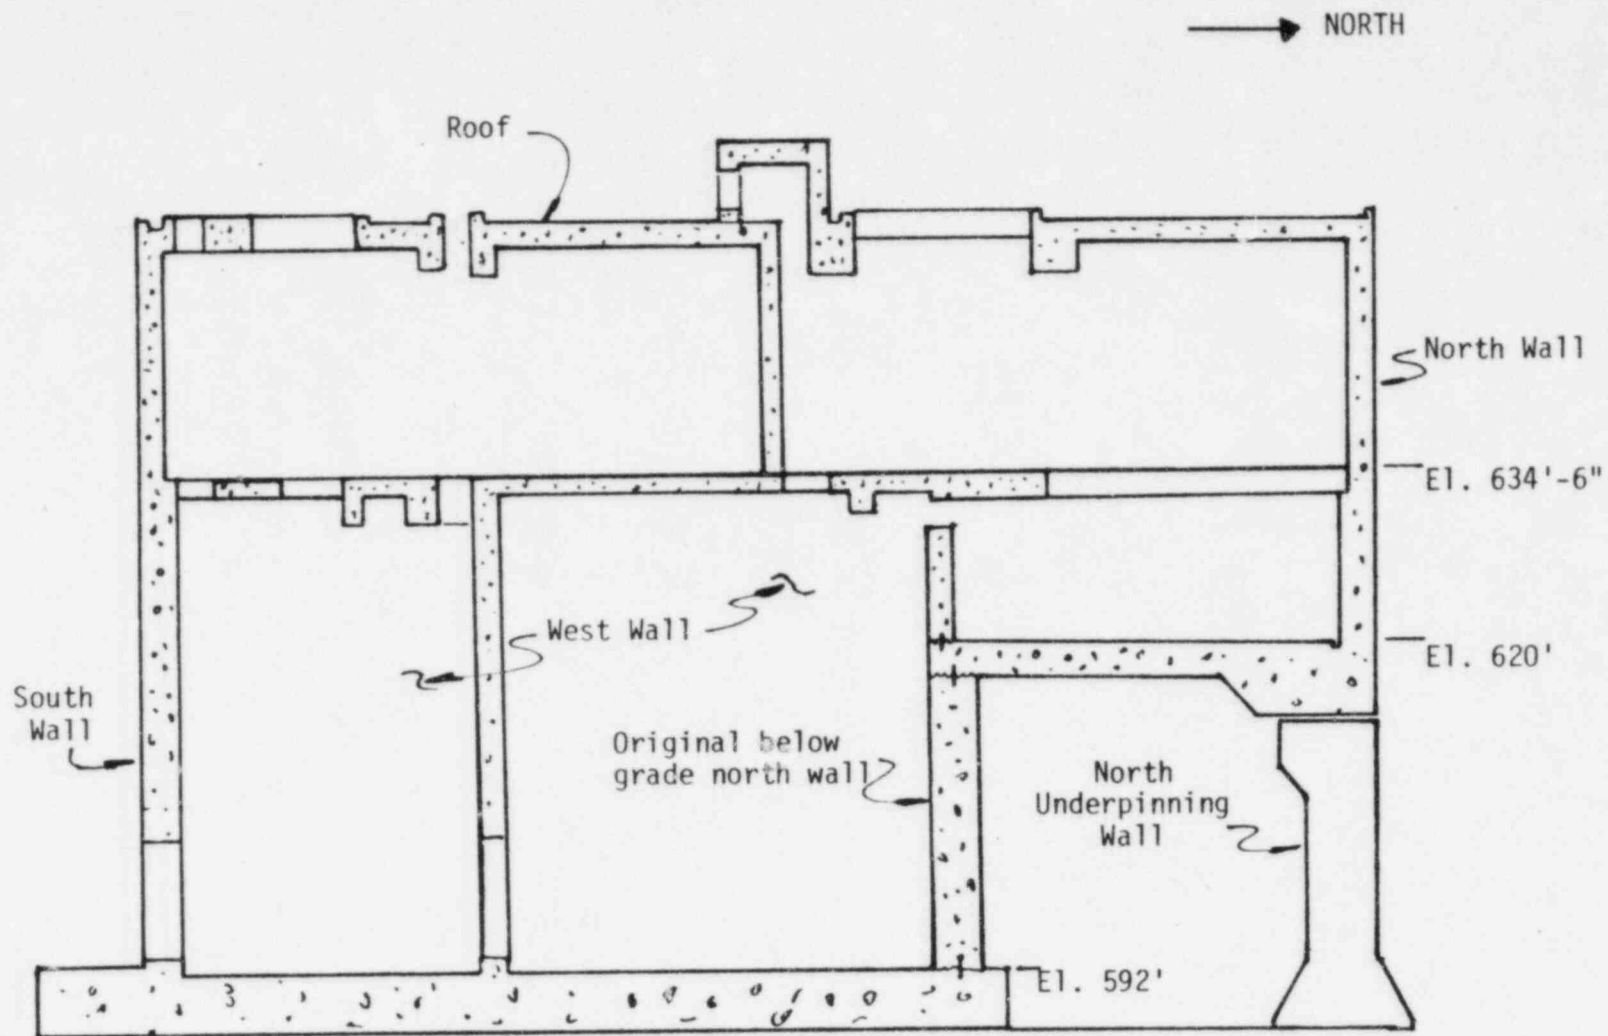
CROSS SECTION OF SERVICE WATER PUMP STRUCTURE LOOKING WEST
